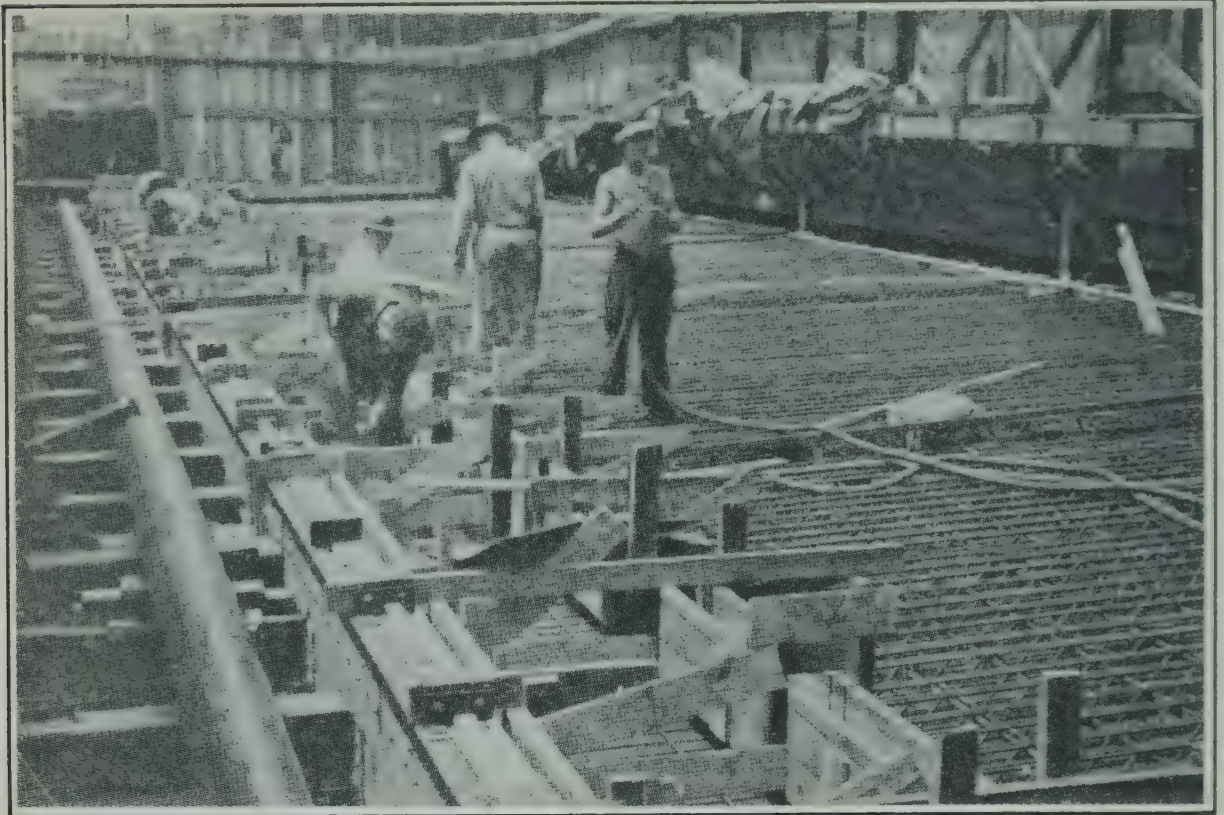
Trussed reinforcement in the roadway of the West Thirty-seventh St. Bridge over the New York approach to the Lincoln Tunnel.
